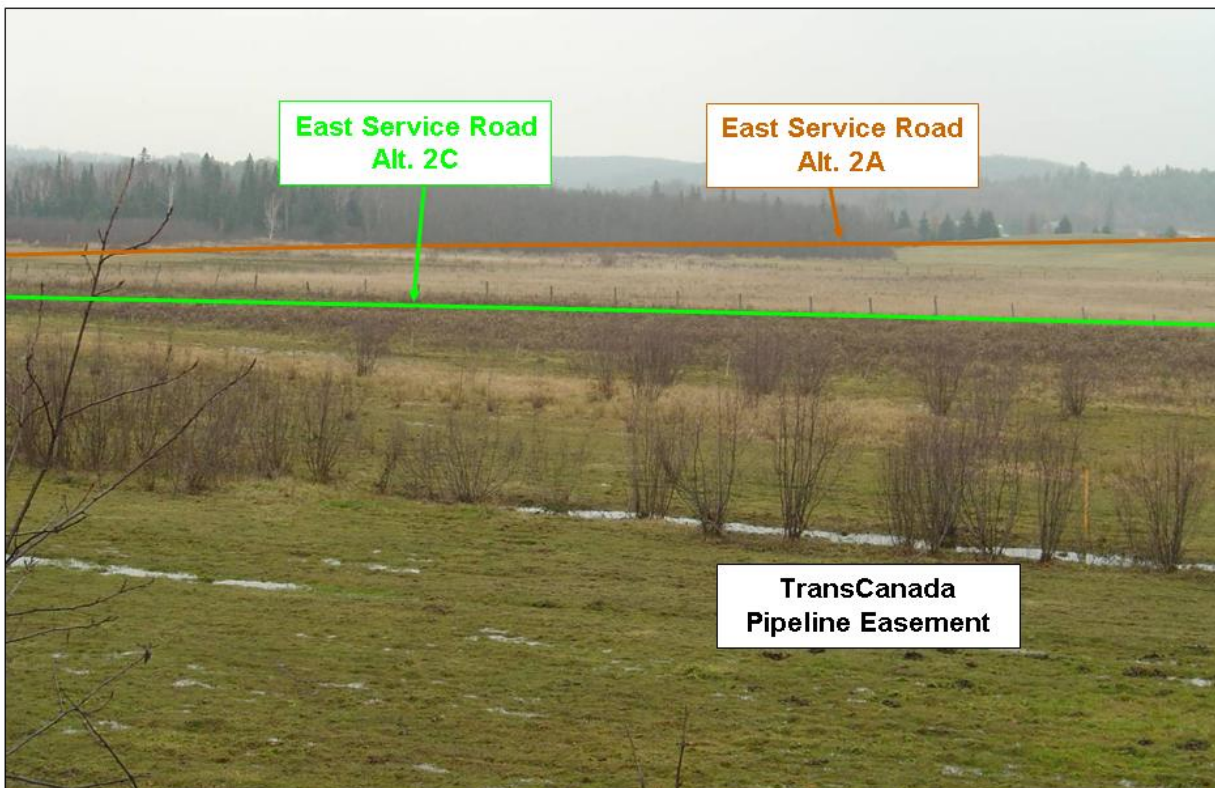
VIEW: Looking northerly from TransCanada Pipeline Ltd. crossing of Rowanwood Road across Bullen Creek floodplain. Both east Service Road alternatives traverse the Bullen Creek floodplain. (Sept. 26, 2008)
